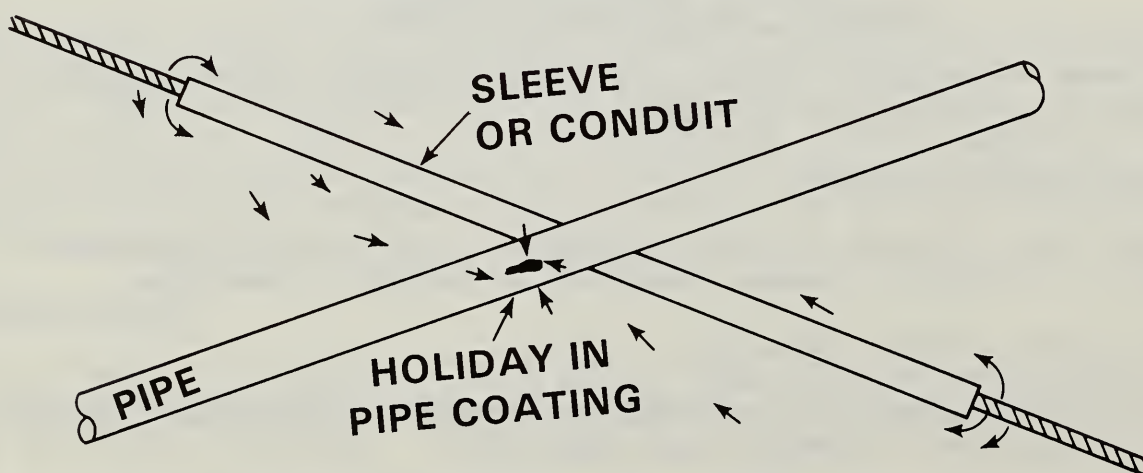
Underground cable and pipeline crossing with a protective sleeve over the cable.
